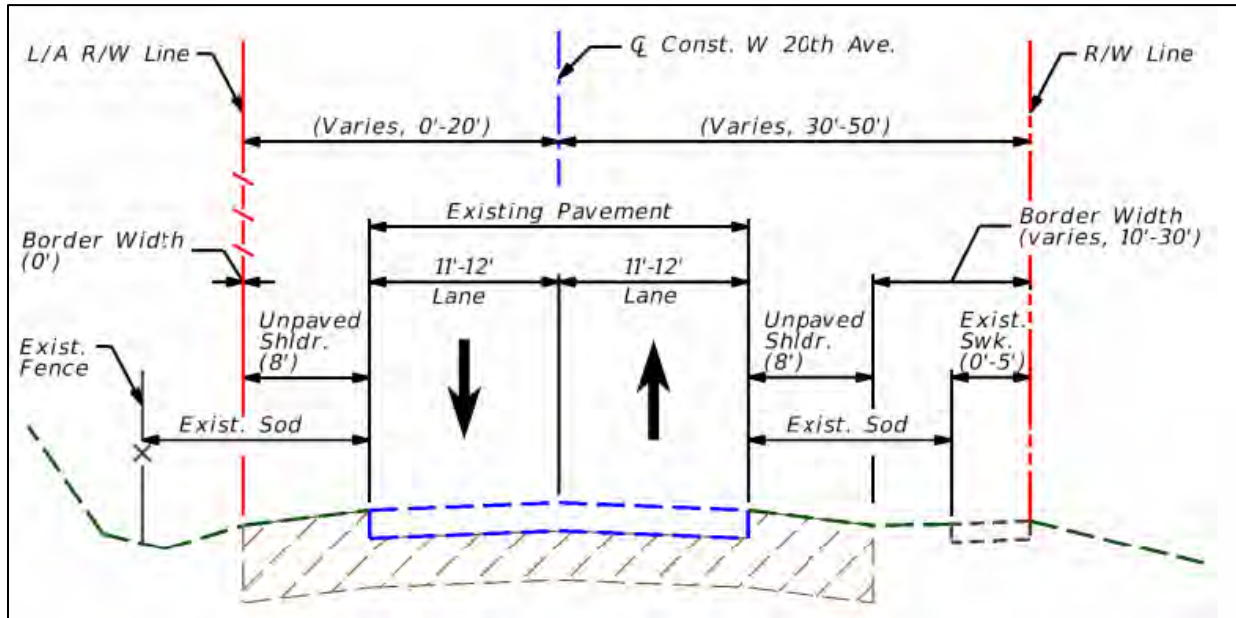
Existing Frontage Road (Undivided) – Typical Section 1 (East Frontage Road/W 20th Avenue)
